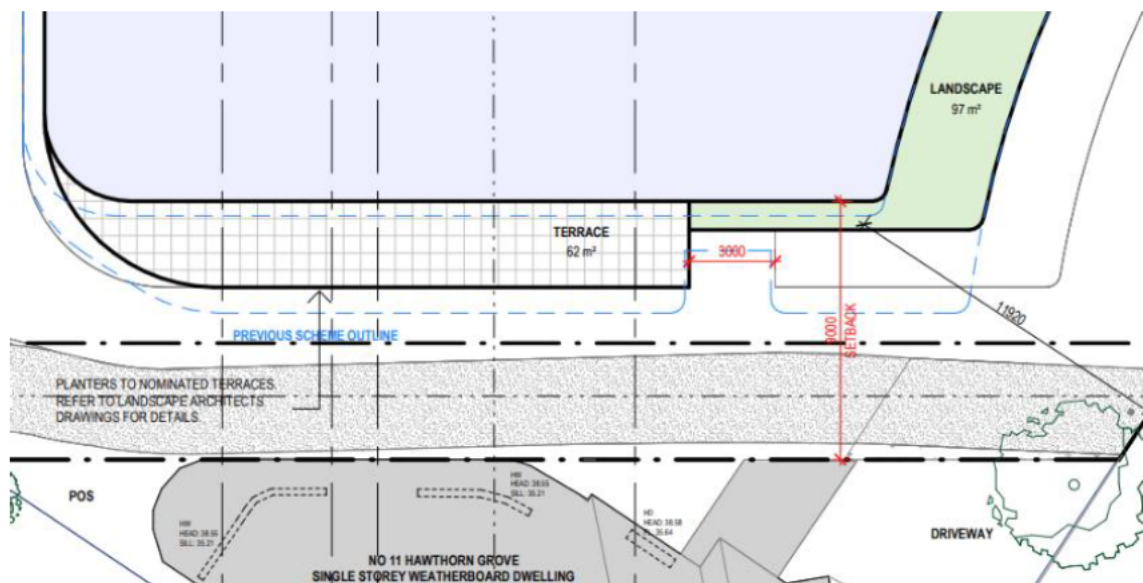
Excerpt from sketch plan of 57A amendment demonstrating extent of built form reduction at the south-western corner of the site compared to advertised proposal (dashed blue line) at level 2.
